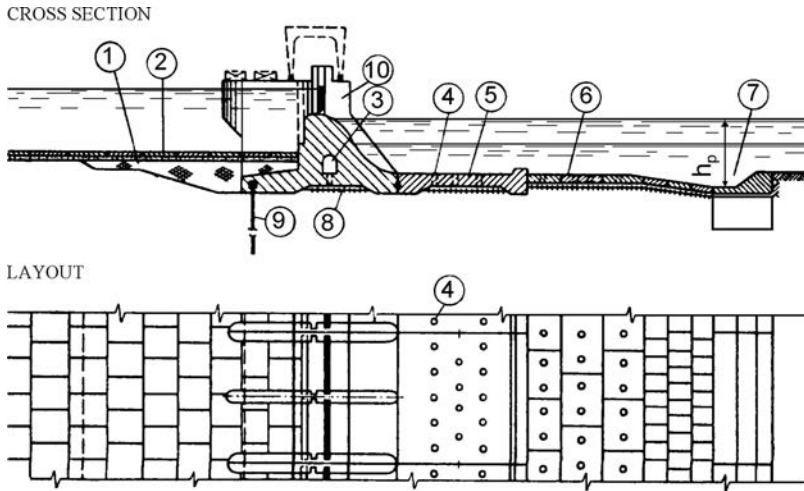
An overflow dam on sandy foundation with sheet piling at the upstream face. (1) Clay blanket; (2) protective concrete slabs over sand layer; (3) drainage gallery; (4) drainage openings; (5) stilling-basin slab; (6) concrete slabs for the protection of riseberms; (7) end of riseberm; (8) drainage with inverse filter; (9) steel sheet piling; (10) training wall.
